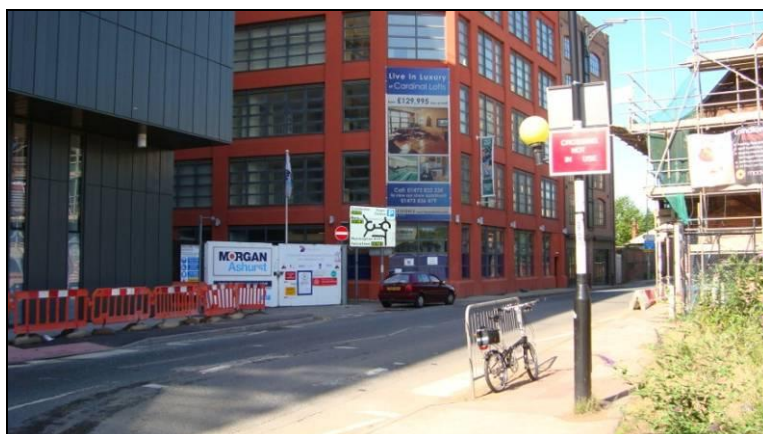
College Street near Foundry Lane showing the location of the proposed Toucan Crossing to replace the current Zebra Crossing
